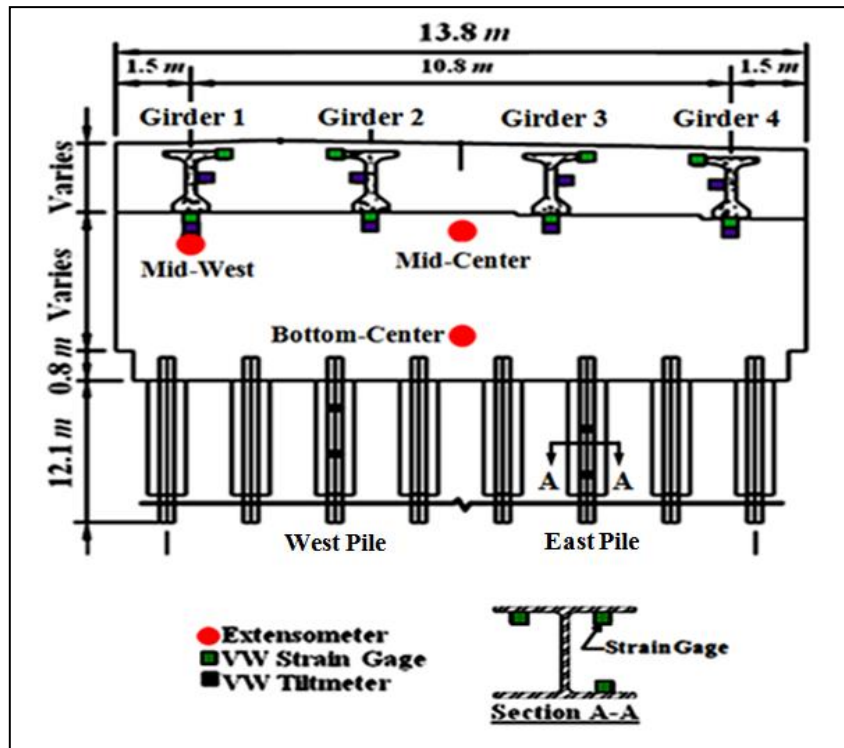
Instrumentation plan of north abutment elevation view [44].
